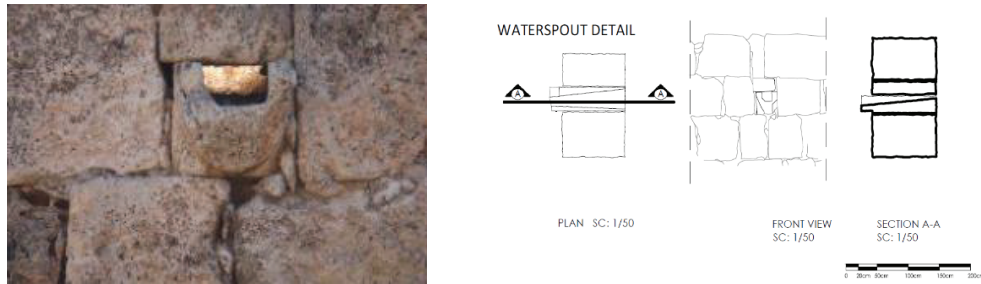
The water spout at the north (left) and waterspout detail (right)
